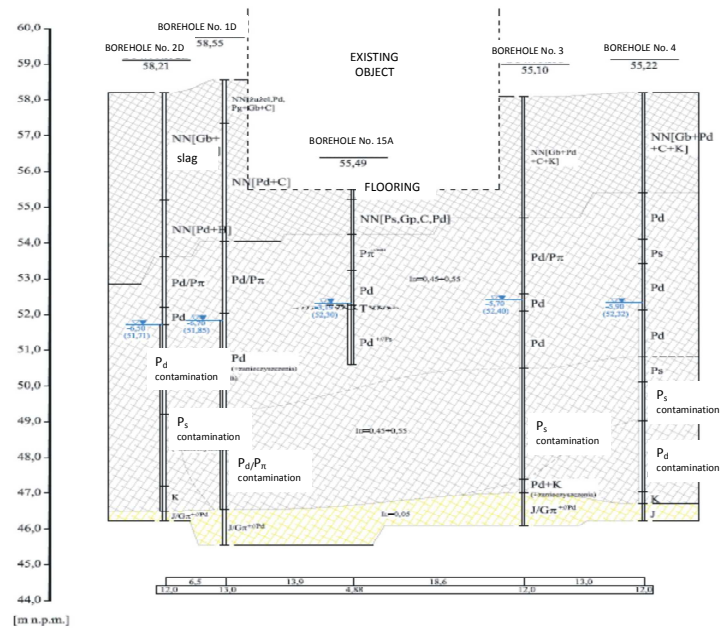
Geotechnical cross-section under the existing Dressing Room and Bath (Szatnia-Łaźnia)
